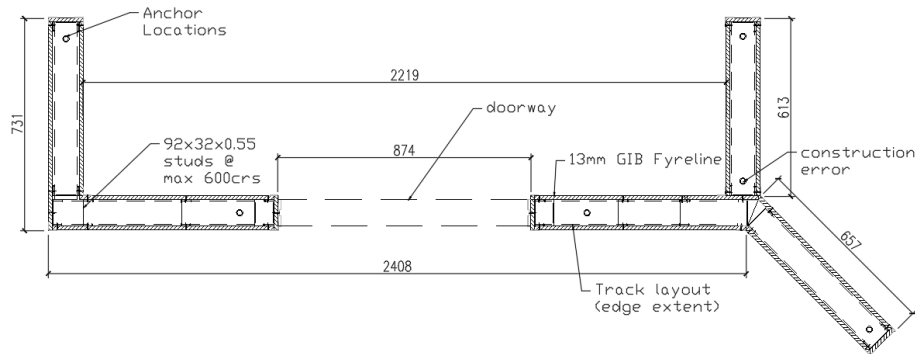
Specimen A3 plan dimensions and top track anchor locations (dimensions in mm)
